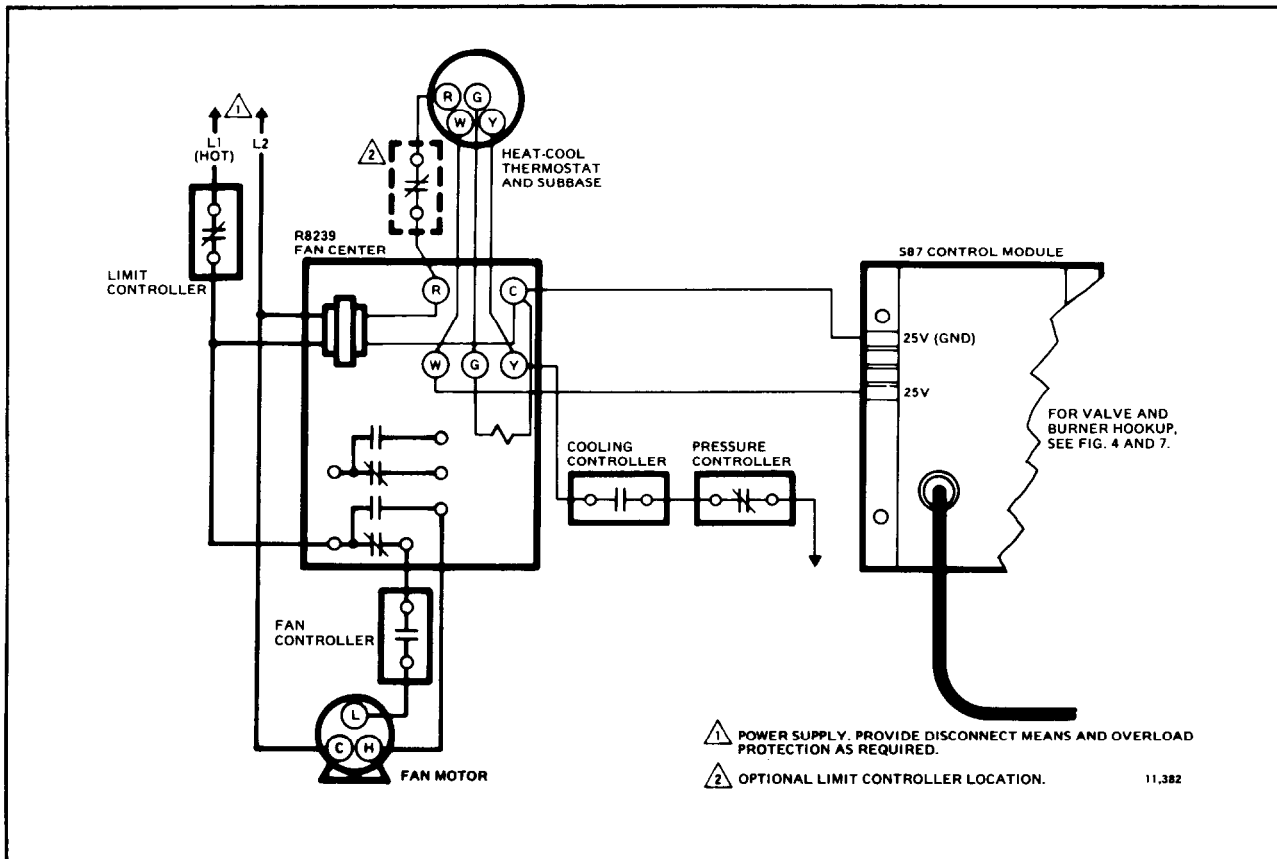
WIRING HOOKUP FOR Y343B PACKAGE IN A TYPICAL HEATING- COOLING SYSTEM.
